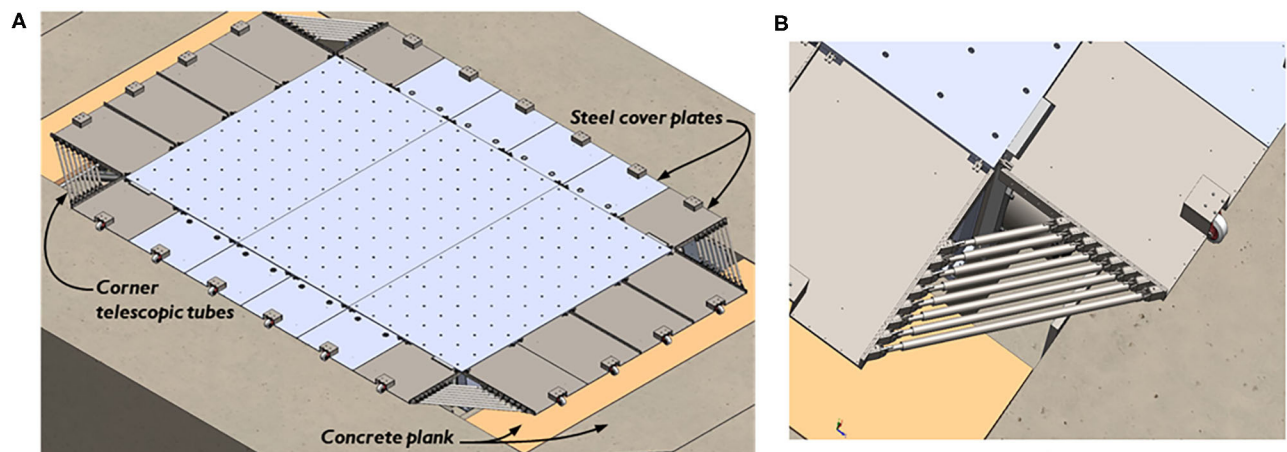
| View and rendering of the cover plate system: (A) steel plates locations in the at rest position, and (B) steel plates and telescopic tubes at the corners.
